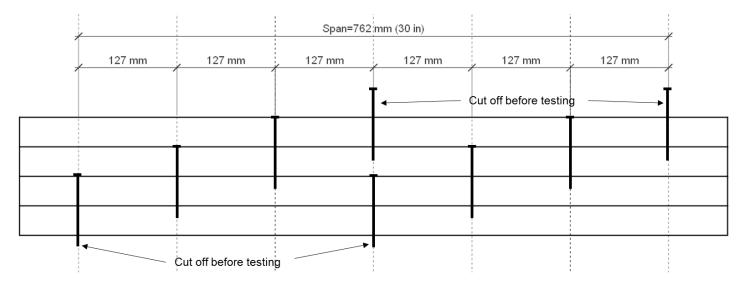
NLT bending-shear test specimen: nail locations front view
